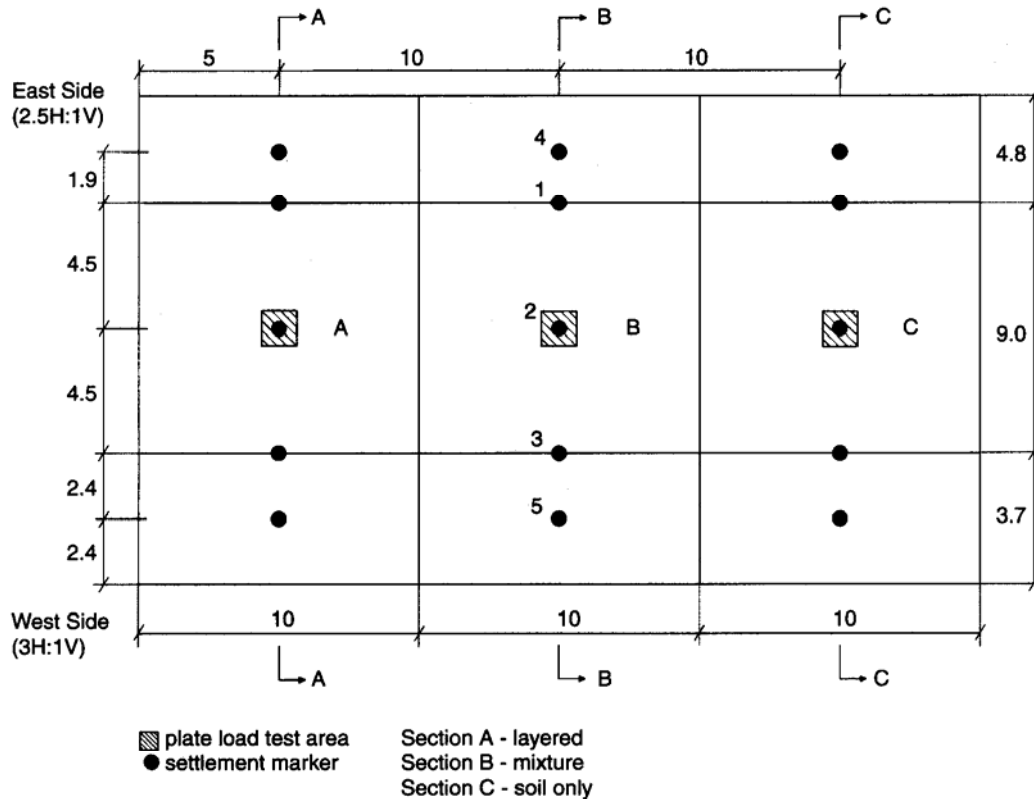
Plan view of prototype embankment (dimensions in meters) (H = horizontal, V = vertical).
